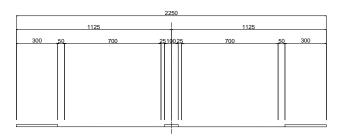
Typical Cross Section of Bombo Road Widening
